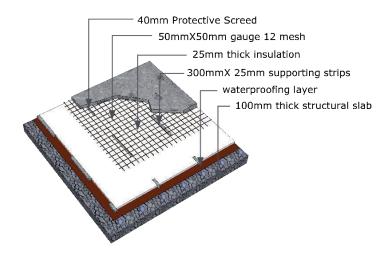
, Newly designed roof slab insulation system (Kasun Nandapala & Halwatura, 2016)
